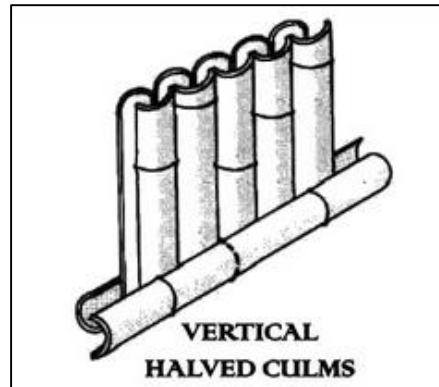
Depiction of the bamboo piled wall made up of the vertical halved culms. The joining of the piles and each half needs to be done in a manner that does not allow mud to escape (Chaudhari and Kolamkar, 2012).
